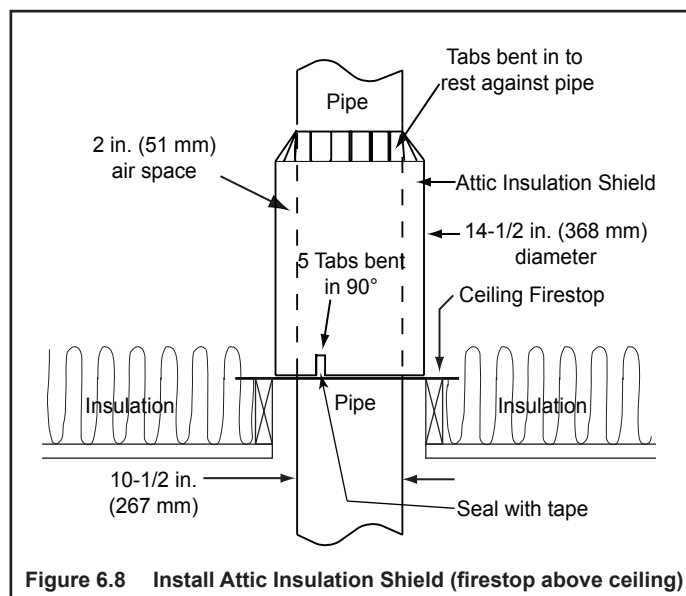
Install Attic Insulation Shield (firestop above ceiling)
